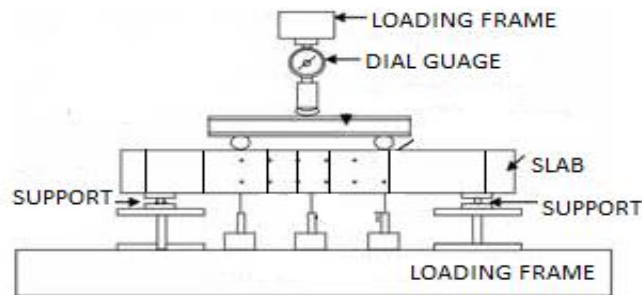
Marking on Ferrocement slab for Flexural Test
